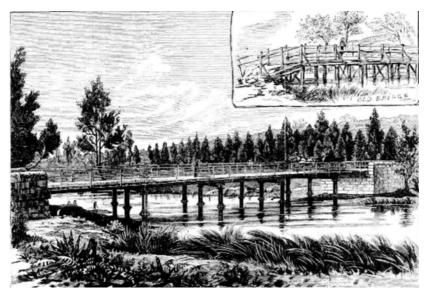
The old timber bridge erected by PA Tompson and the government's then modern iron bridge on Cooks River at Illawarra Road. Parts of the iron bridge remain. Source: Australian Town and Country Journal, 3 /4/1880, p.24
